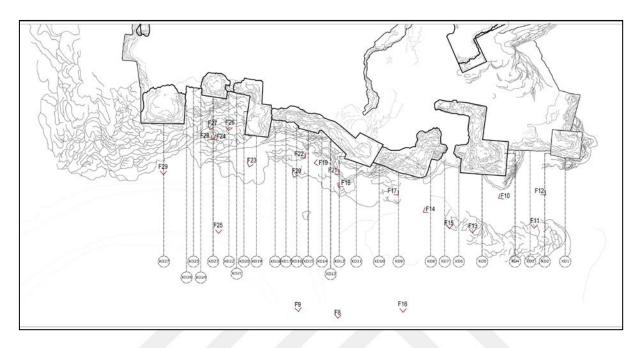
North Side Exterior Walls Photo Aspects and Wall Encodings
